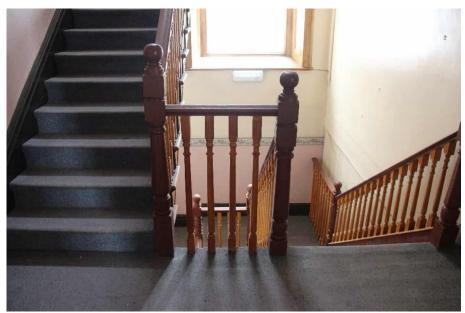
Decorative newels and timber wainscotting to Return level or main staircase.
